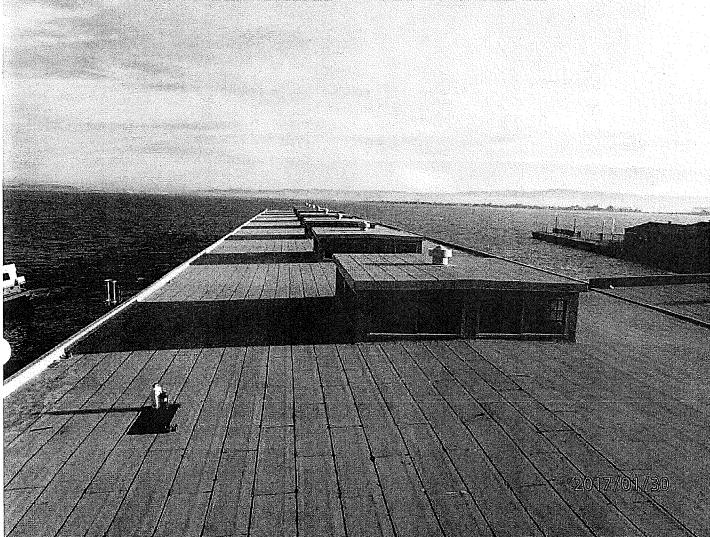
Construction photo of new roofing at Pier 31 shed building.
